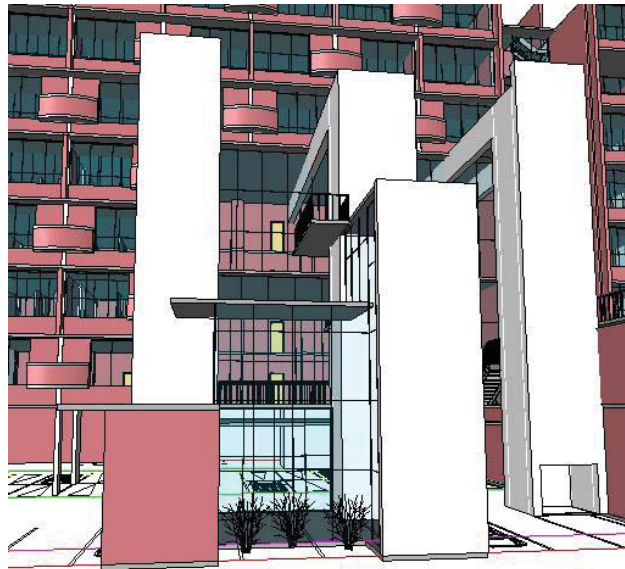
The ticketing office, scene dock and patron lift are located in and around the new column structures
